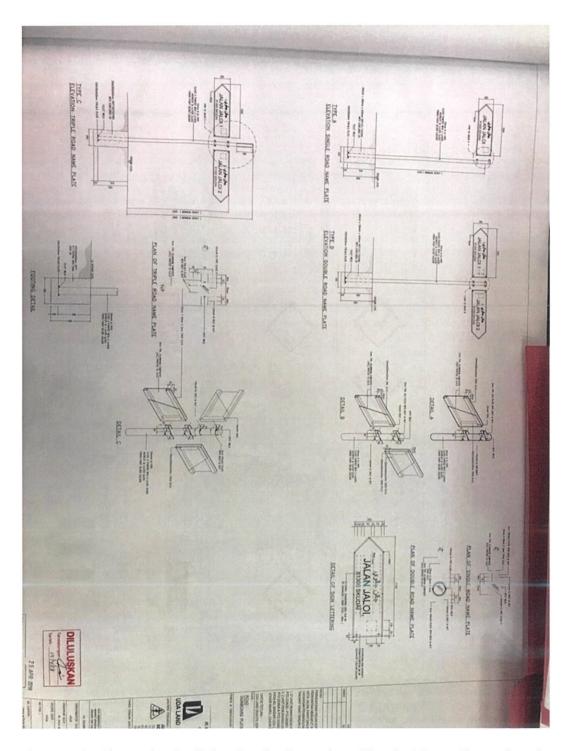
Shows the detail drawing for the road marking for Neuvo Centro 2 project
